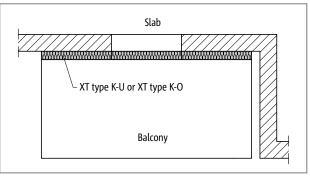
Schöck Isokorb® XT type K-U/K-O: Balcony with facade offset
